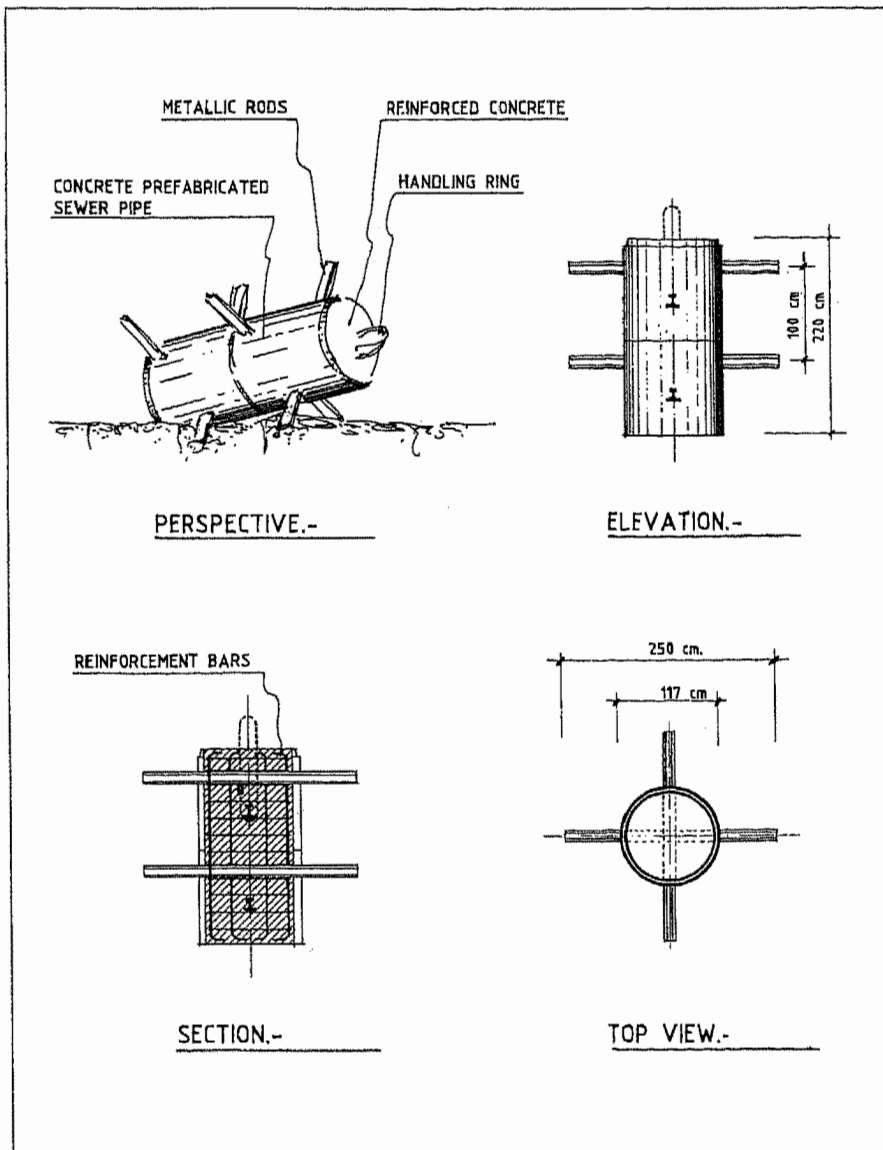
Scheme of the artificial module unit where top, section and elevation views may be observed. Reinforced steels and metallic beams are also represented.
